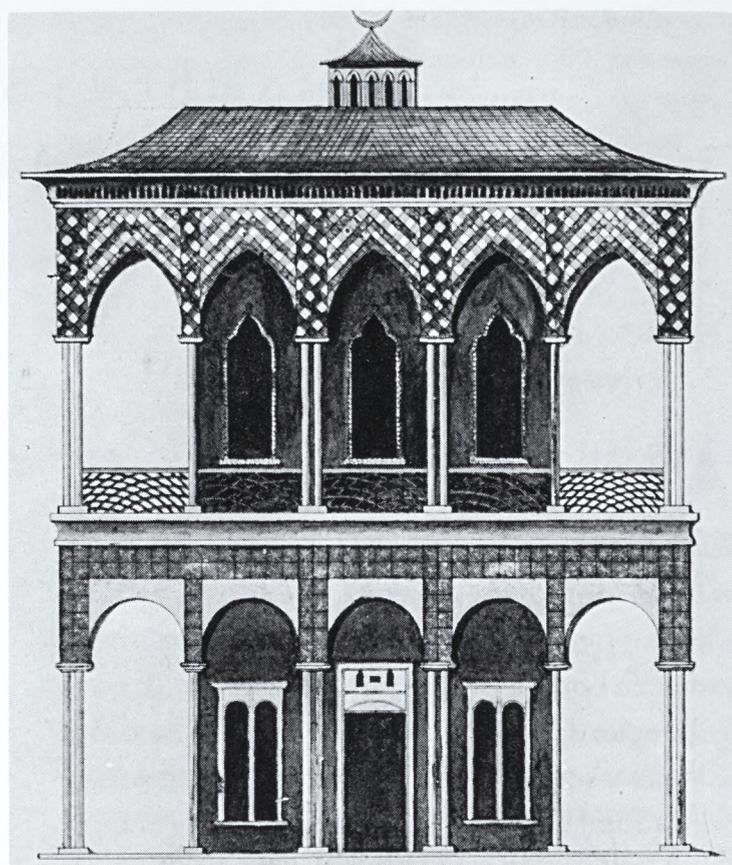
J. H. Muntz, (attrib). 'Plan & Elevation of building in the Moorish taste,' 1750. London, Royal Institute of British Architects, *Drawings Collection*.
